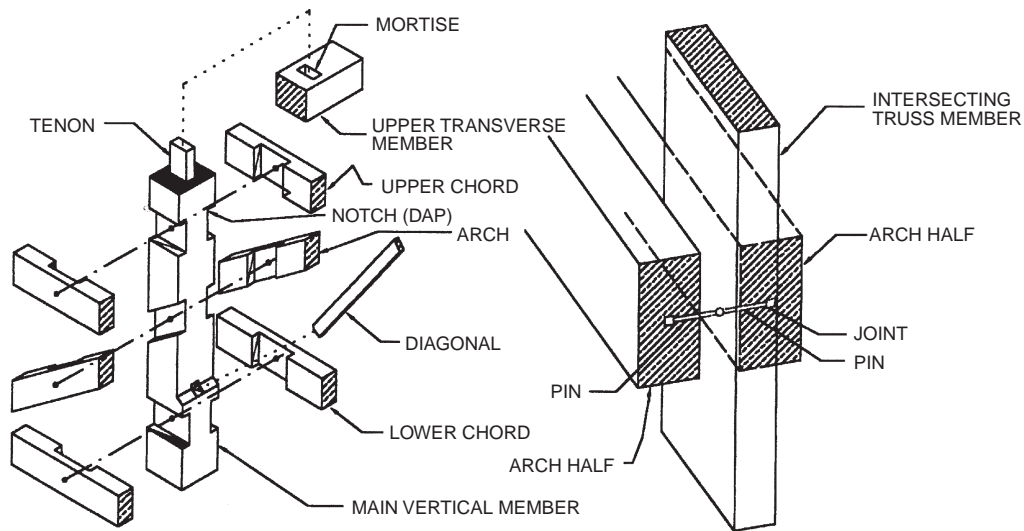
Intersection of arch-vertical and lower chord (Kemp and Hall, [1]).
